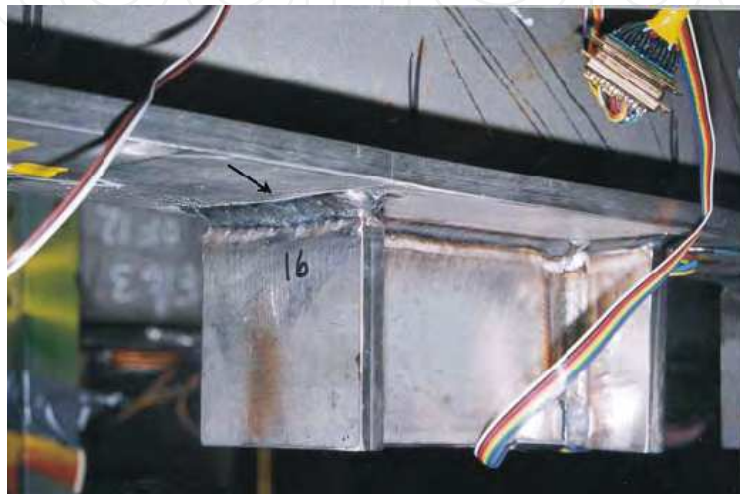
Typical fatigue crack from attachment fillet weld toe in AL-6XN beam
